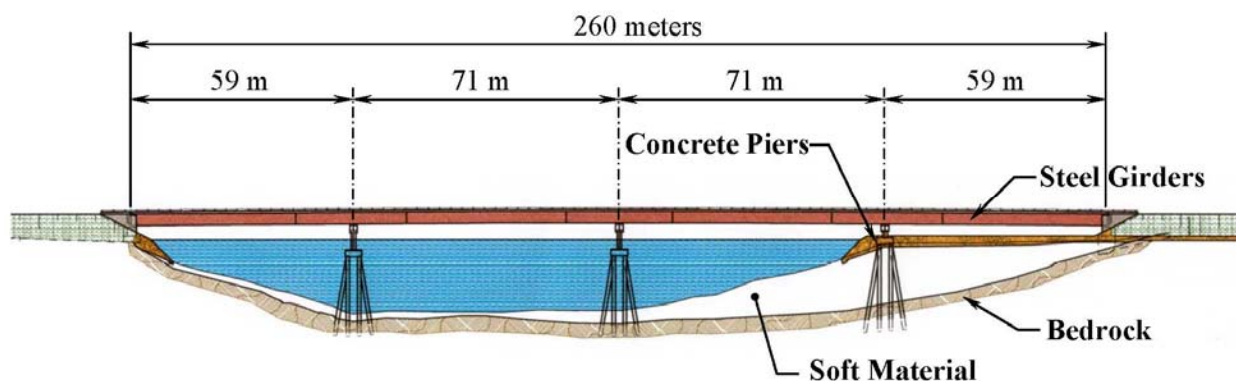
General elevation of the Kichi Sipi Bridge to Cross Lake.
